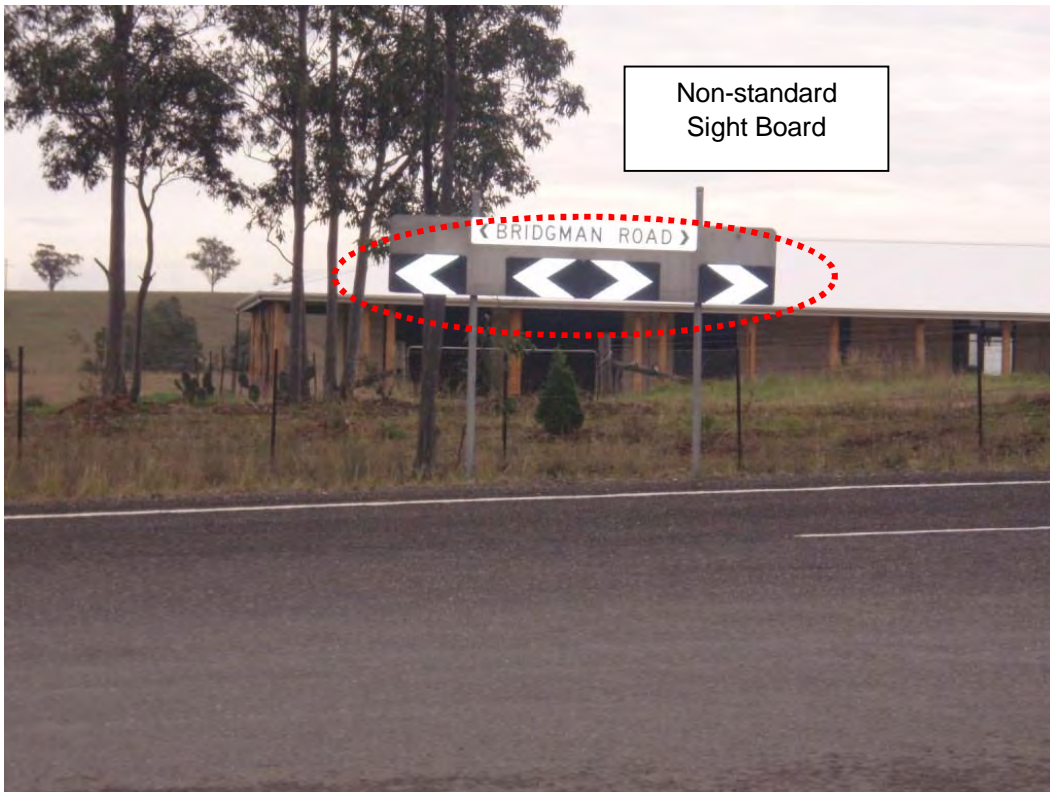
Bridgman Road, looking south towards its intersection with New England Highway
